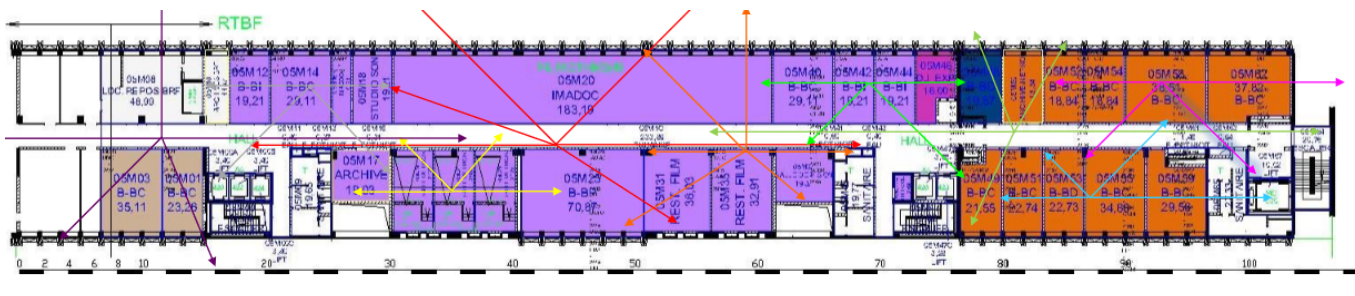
Design at 2.4 GHz for Floor 5 in Building CHJM
